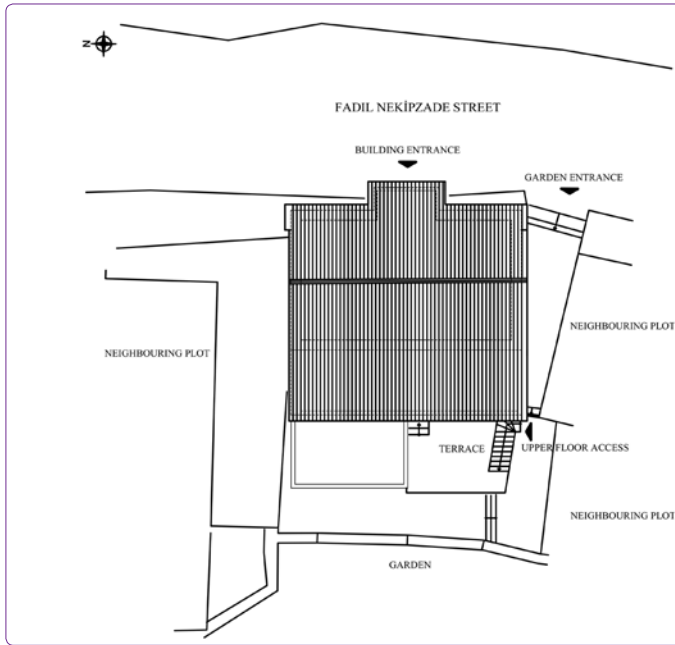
Building plot – building relationship, site plan. Source: Makbule Oktay, March 2019.
